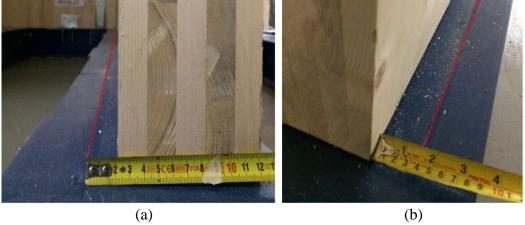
Translation of the internal walls on (a) longitudinal and (b) transverse tests.
